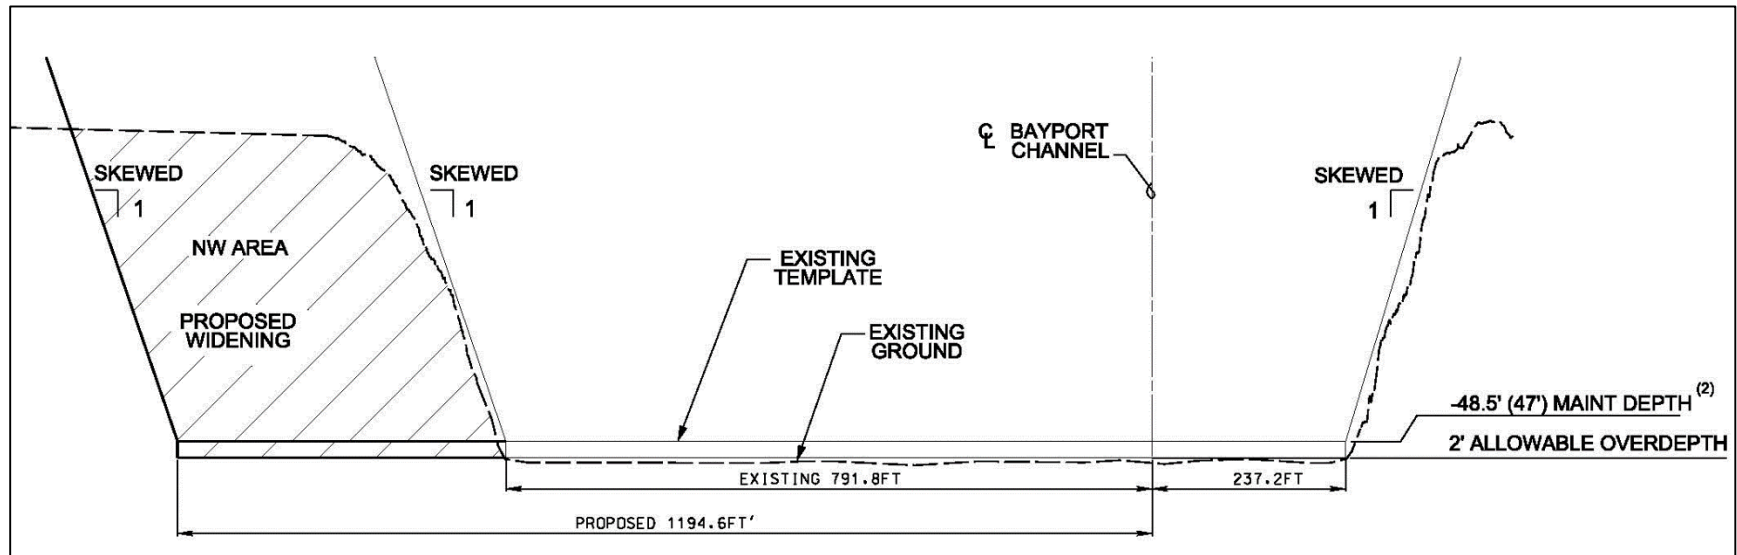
Flare Widening to 4,000 feet (Alternative 3; Corrective action)
